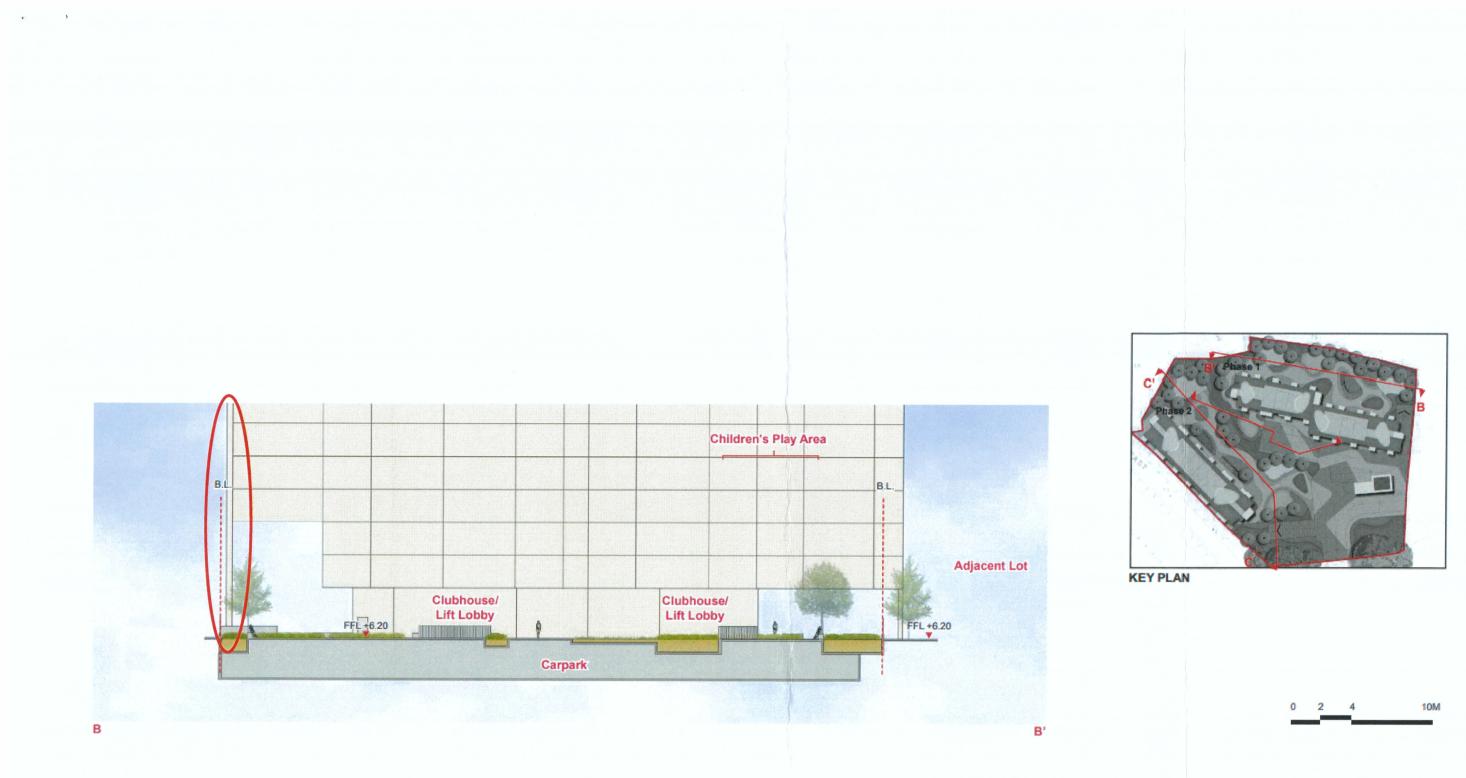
A large blank wall adjoining to my lots (source: Landscape Proposal from the Application (no. Y/YL/19))
